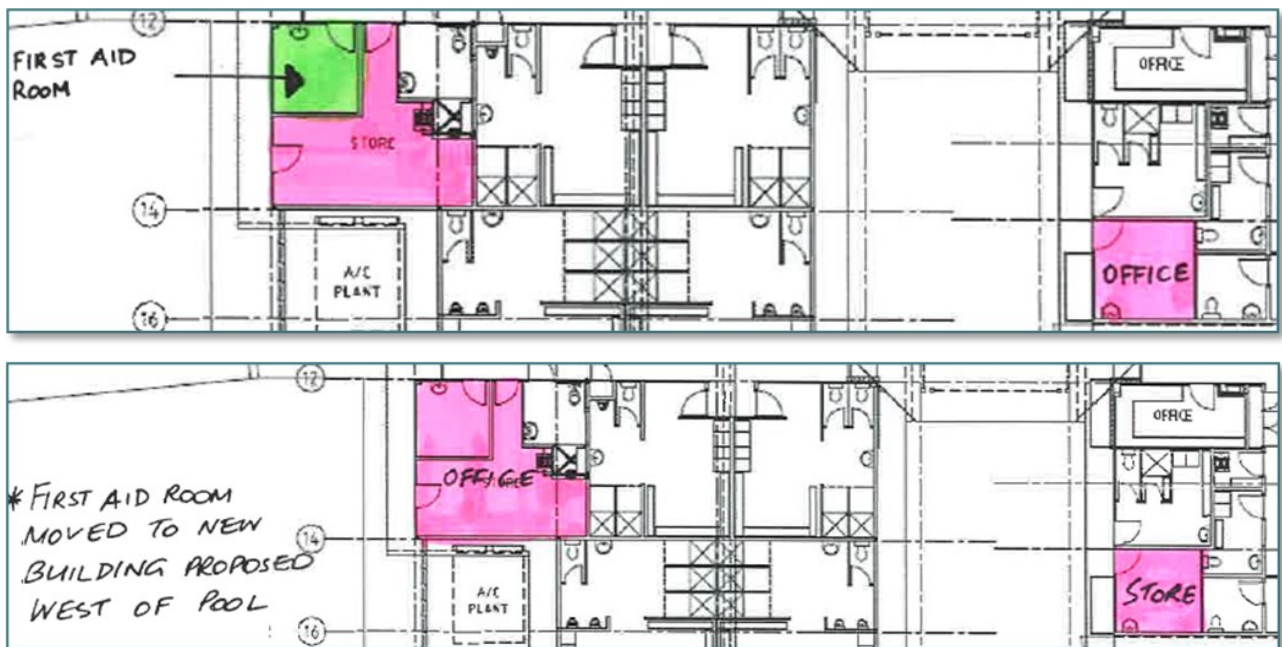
Existing building layout (top) and proposed building changes (bottom)
